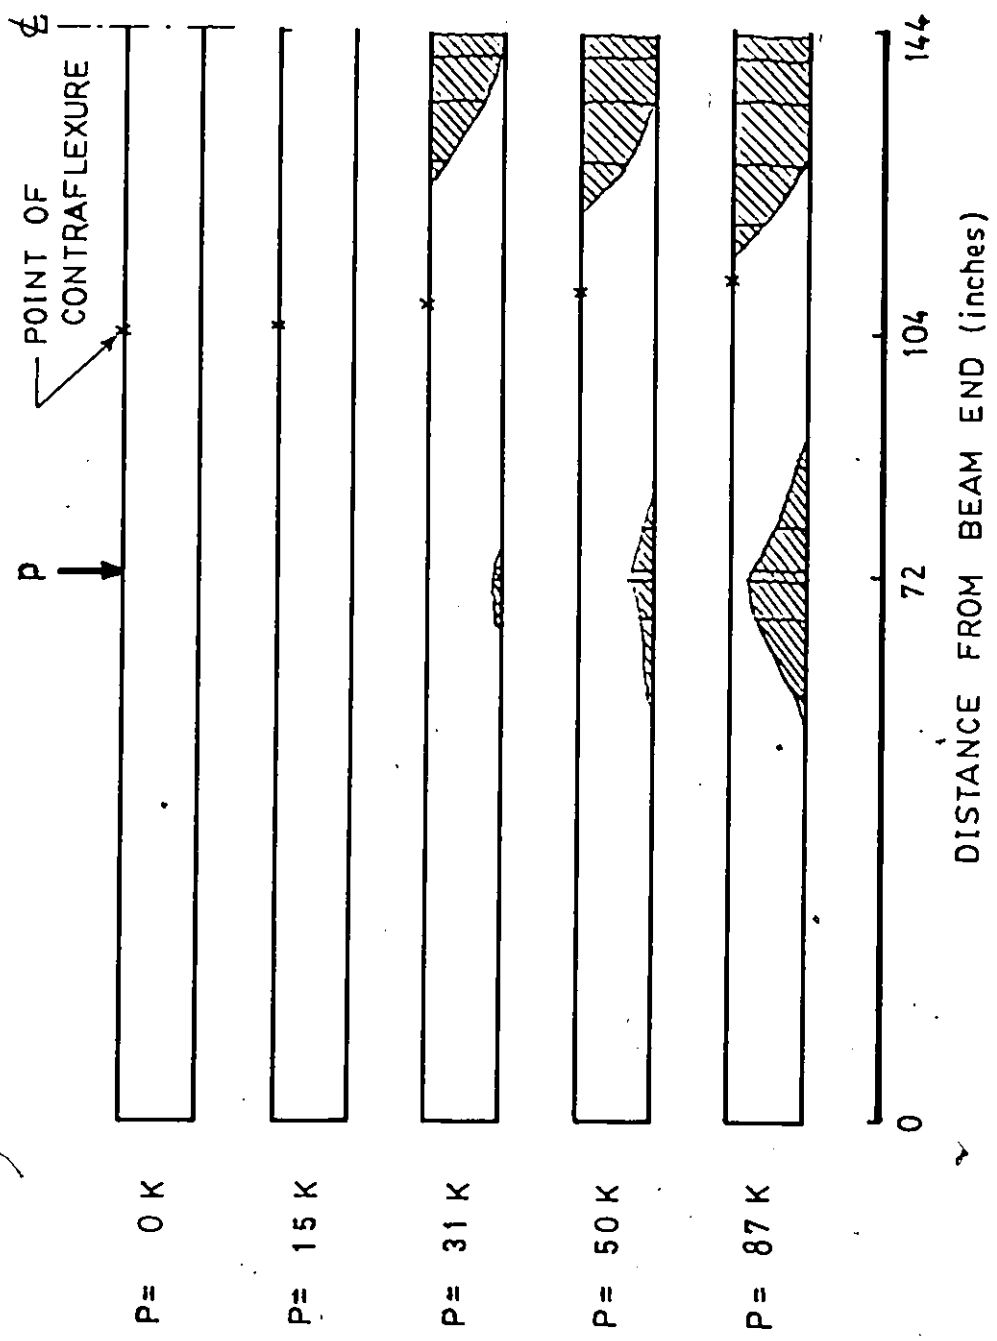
APPROX. CRACK PROPAGATION IN CONCRETE SLAB FOR BEAM CB3
